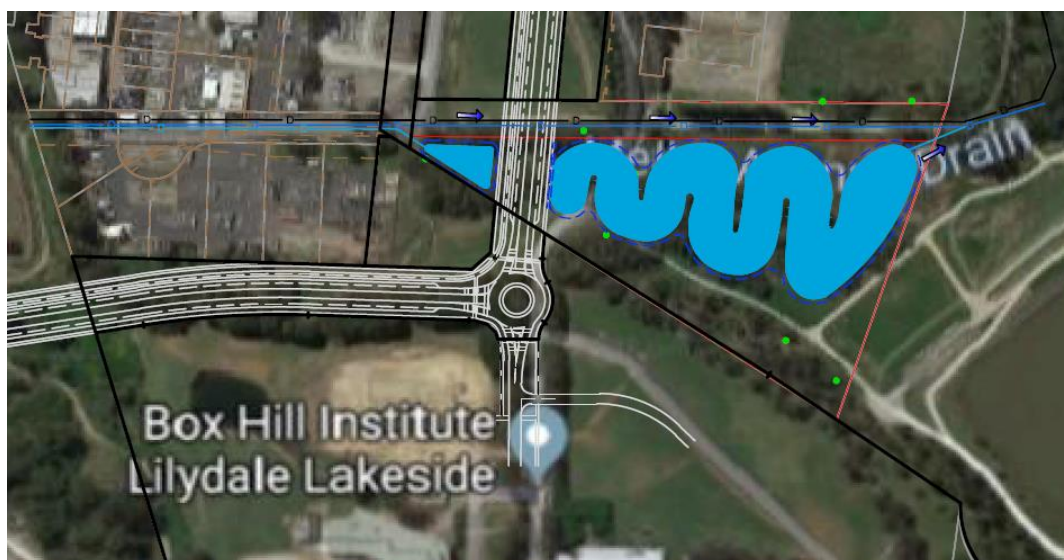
Proposed Treatment Layout for Melba Avenue Main Drain Catchment
